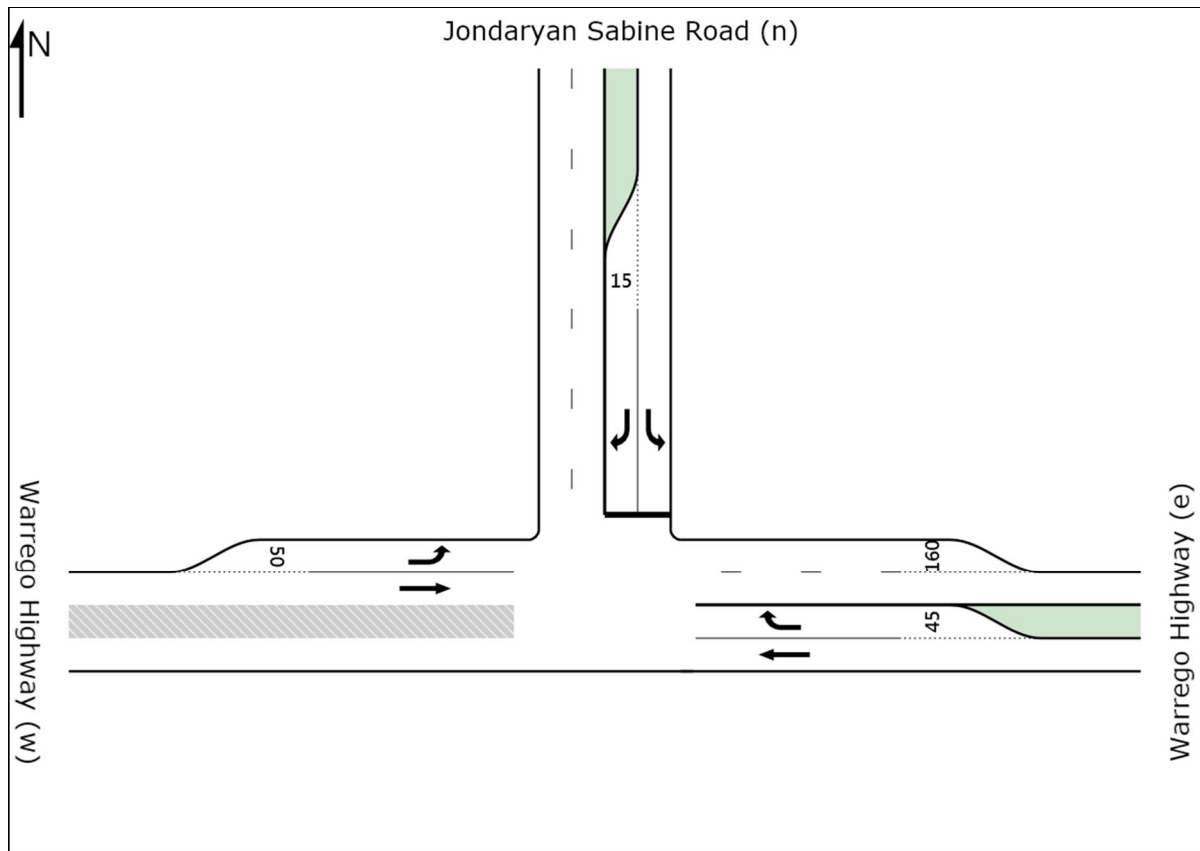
Existing intersection layout- Warrego Highway/Jondaryan Sabine Road
